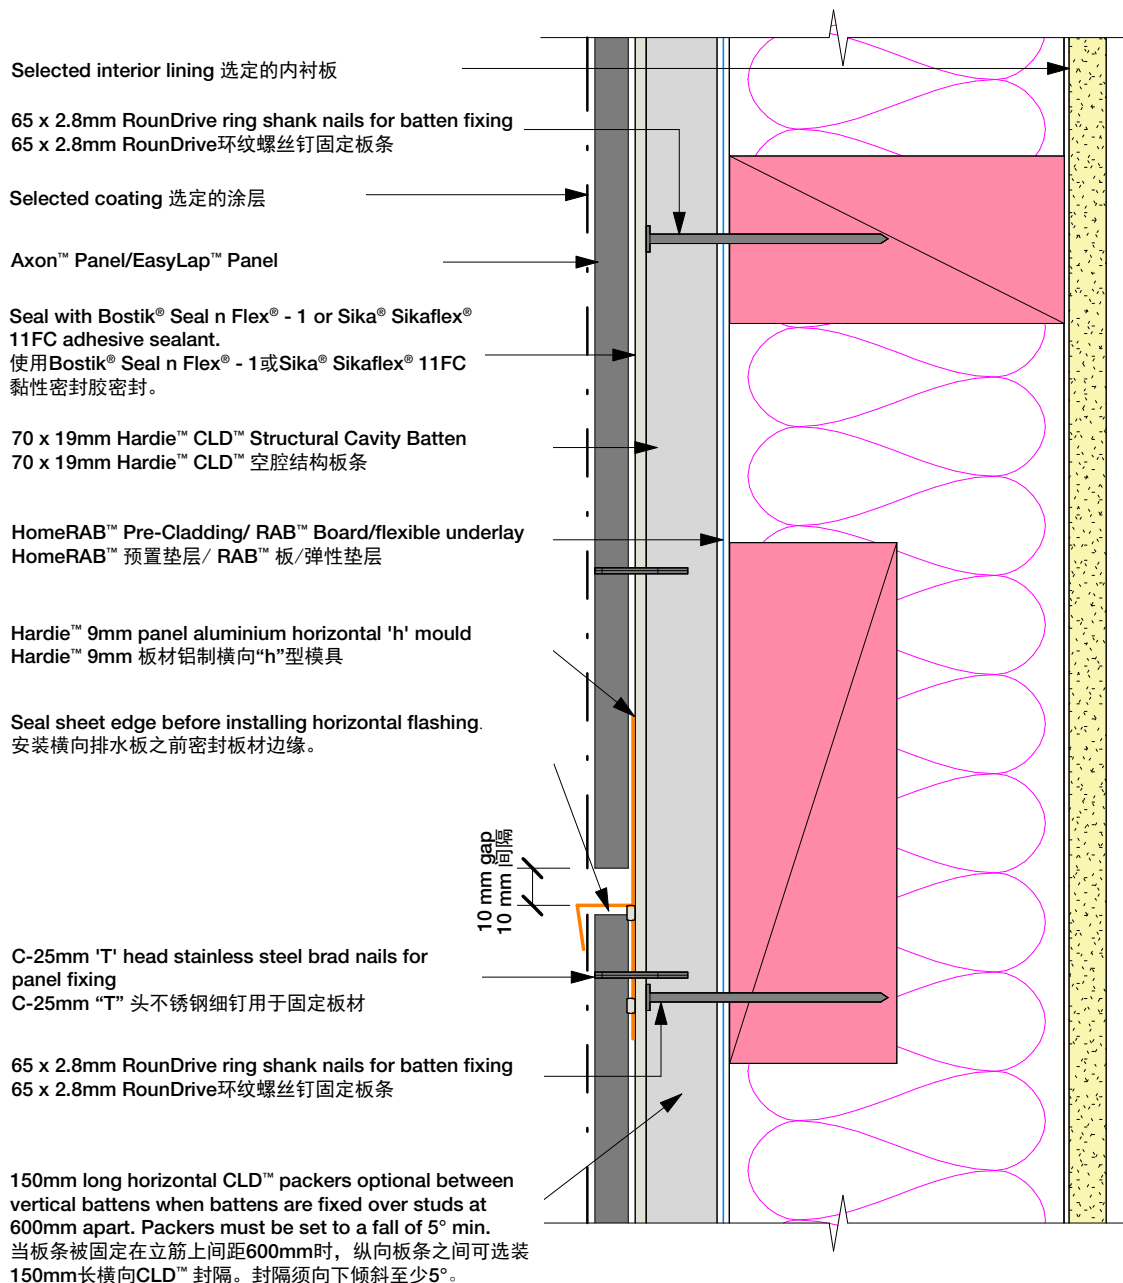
Aluminium 'h' mould joiner | 图28: 铝制“h”型模具接缝件
